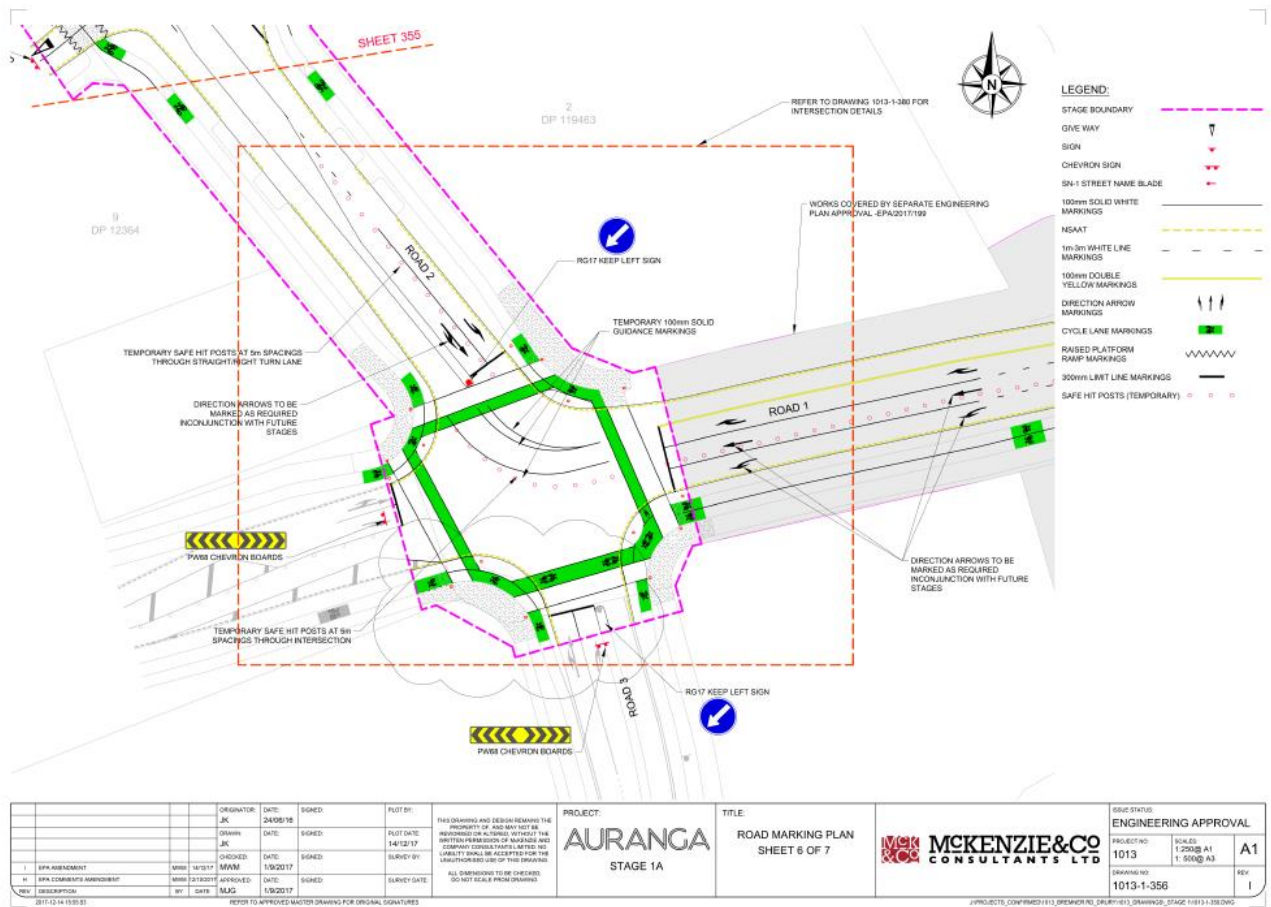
Proposed intersection at Bremner / East-West Collector Road / Road 3
